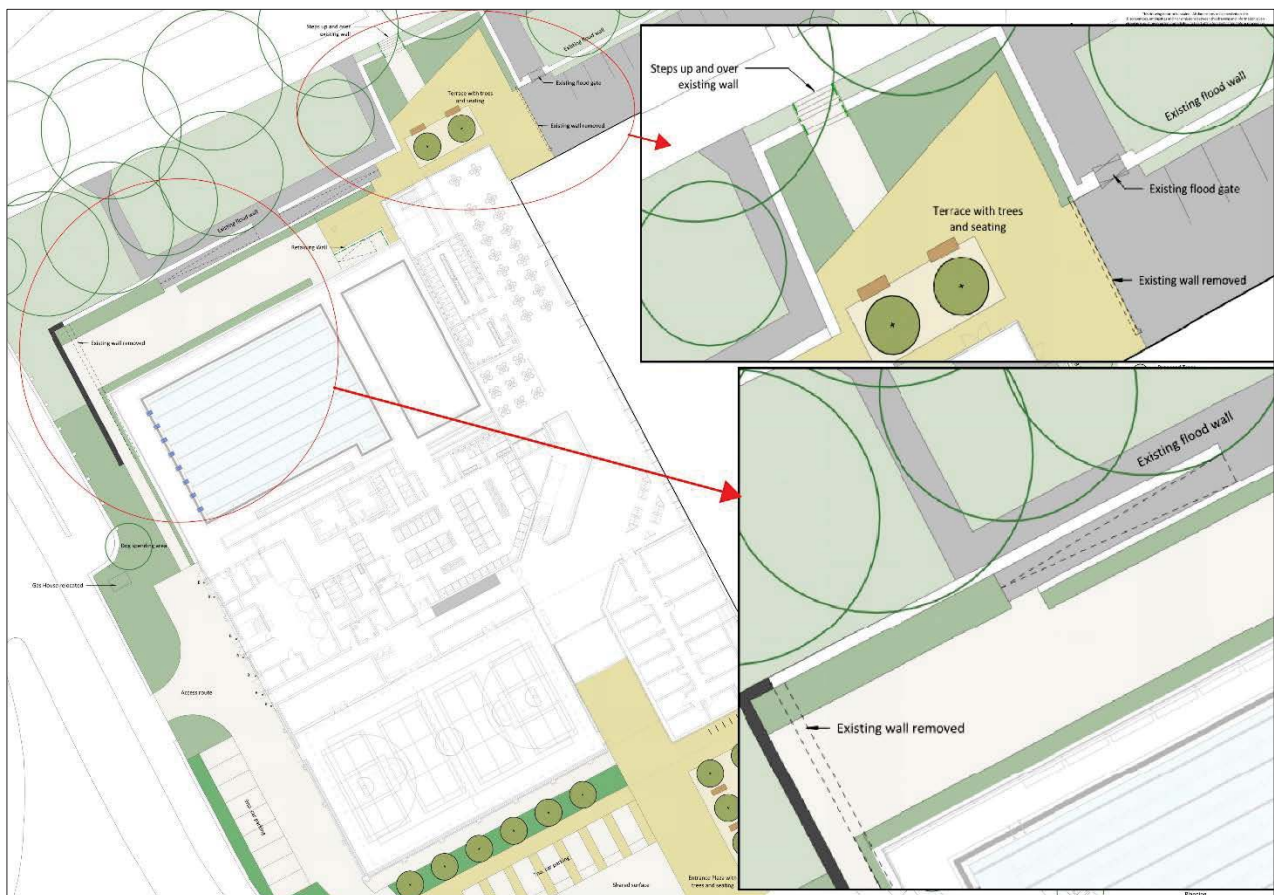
19 Proposed site plan marked up to show proposed realignment of floodwall (DWG GT1385-OOB-SI-ZZ-DR-L-0002 Revision P08 (30 Aug 2018))
